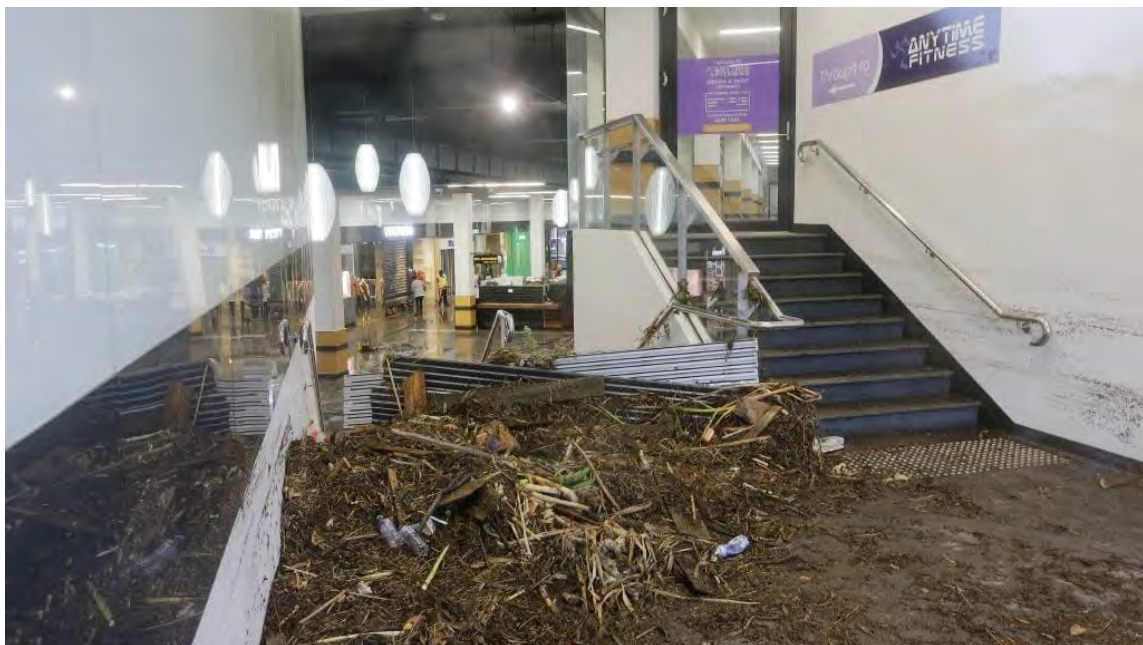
Entry to Channel Court Shopping Centre showing damage due to May 2018 flood
